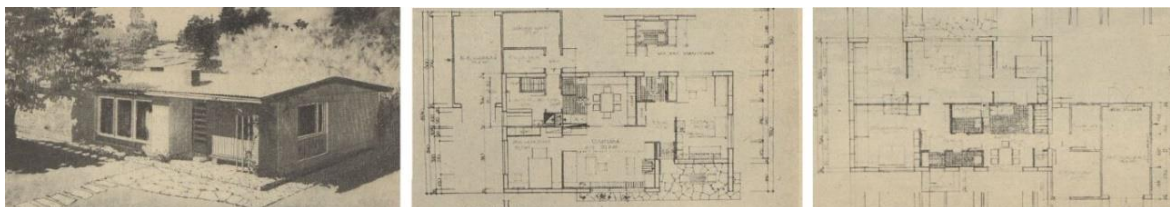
Rural bungalow dwellings from 1968 (left to right: elevation, three-room layout, four-room layout) (Vanaselja, 1968)
